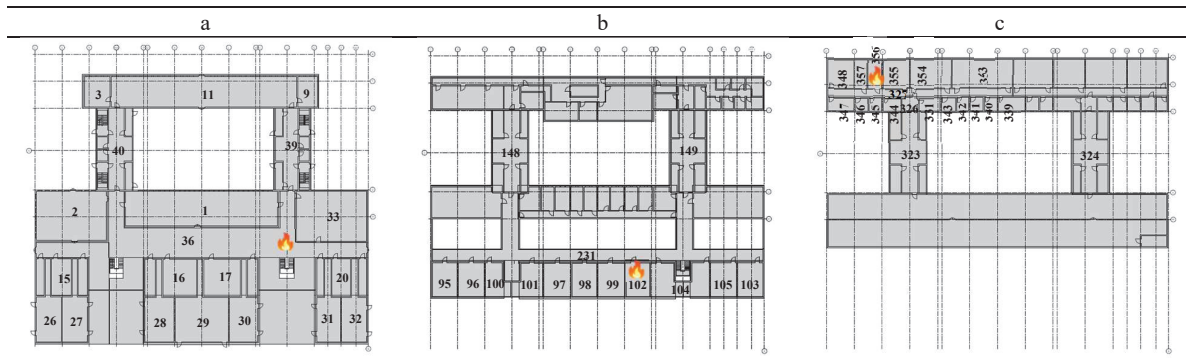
Ground floor, second floor and fifth floor of the pilot building
